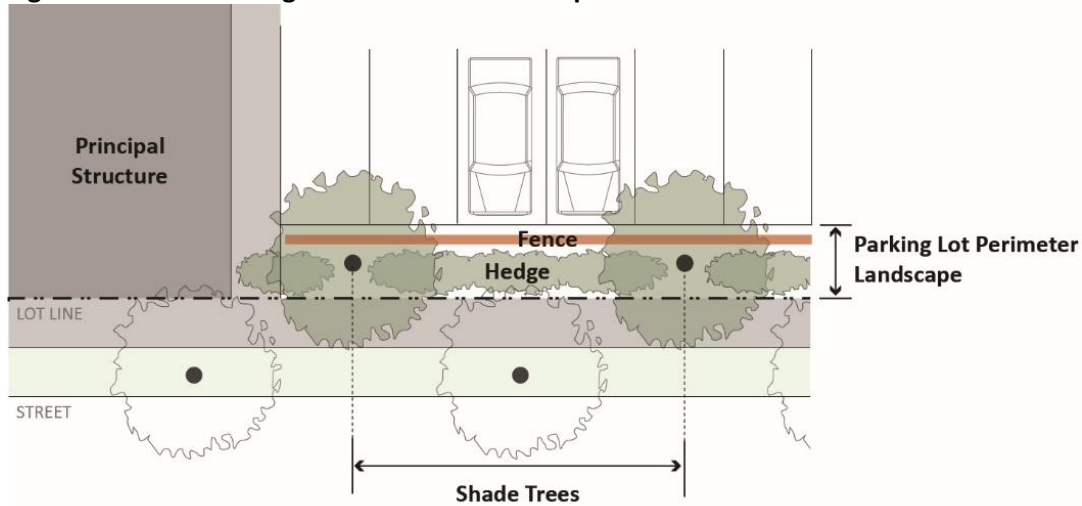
Parking Lot Perimeter Landscape
